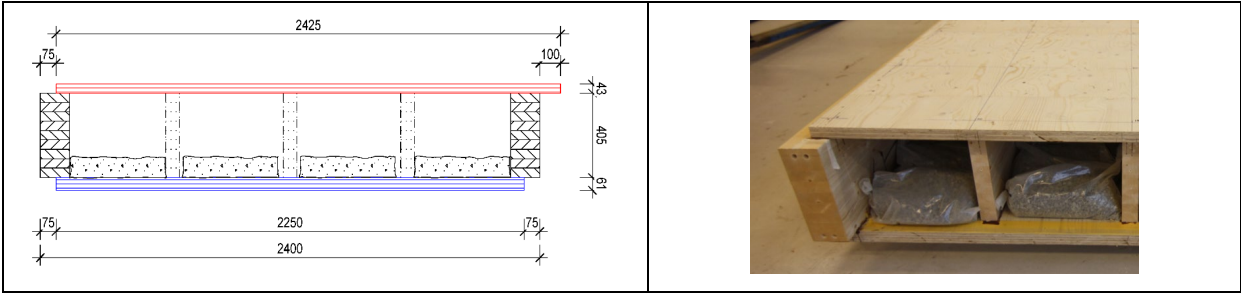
Floor element cross section (left) and picture showing the gravel bags positioned in the element cavity (right).
